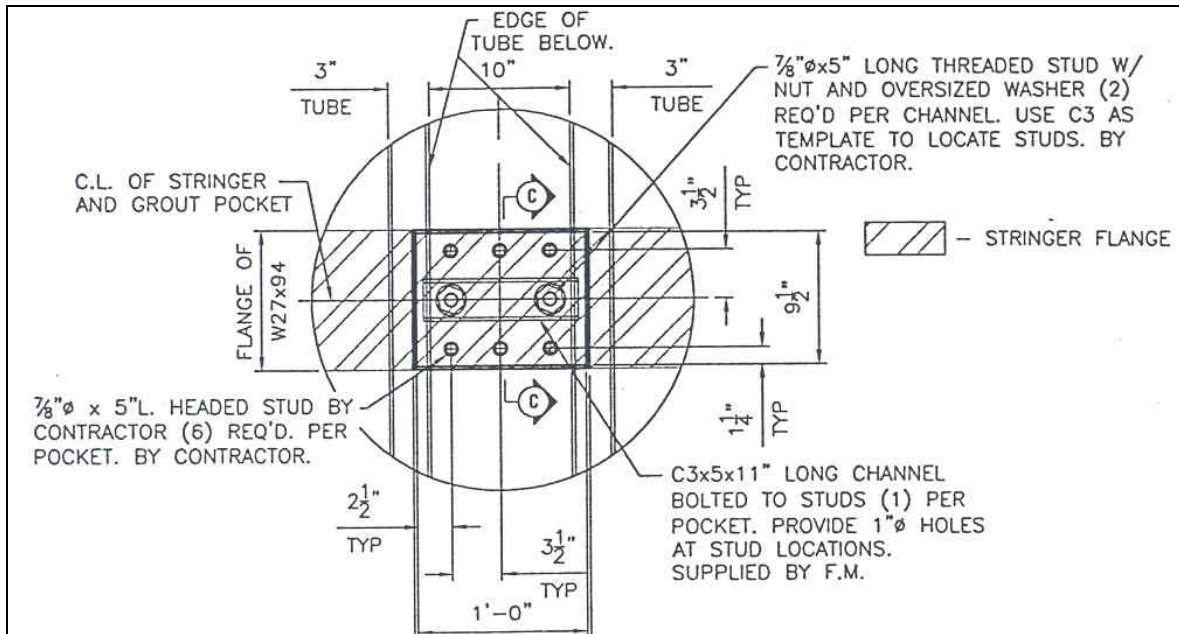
Typical shear pocket plan view for bridge over Little River Town, Stowe, VT (The Fort Miller Co., Inc., 2000)
